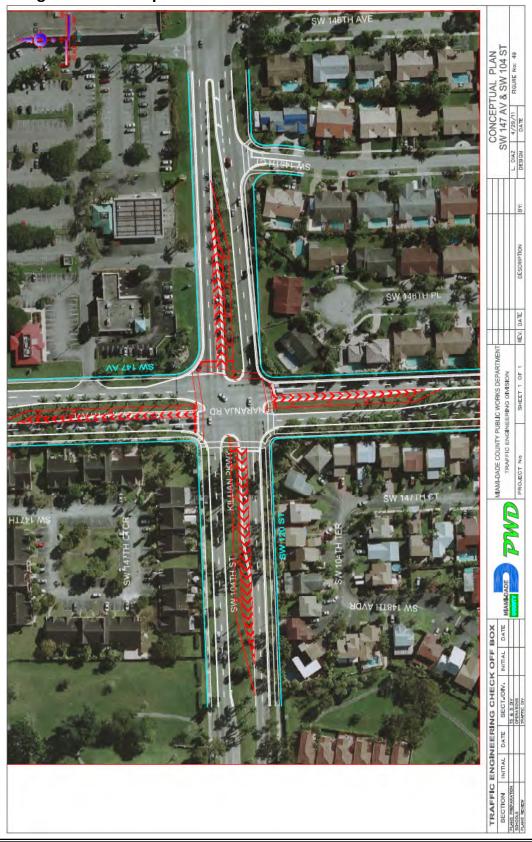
Conceptual Plan – SW 147 Avenue and SW 104 Street
